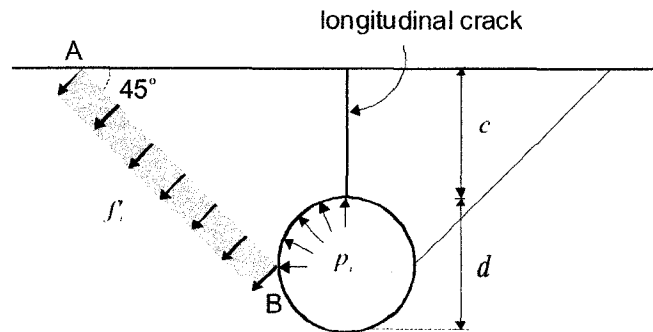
Longitudinal cracks and spalling (Martin-Peréz 1999)
